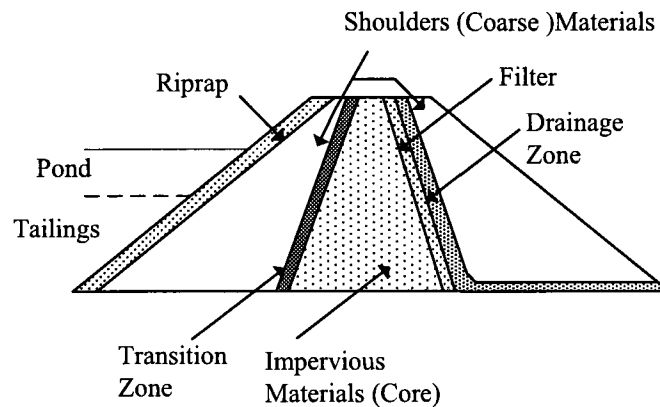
A typical section of a zoned water-retention dam used for tailings storage
